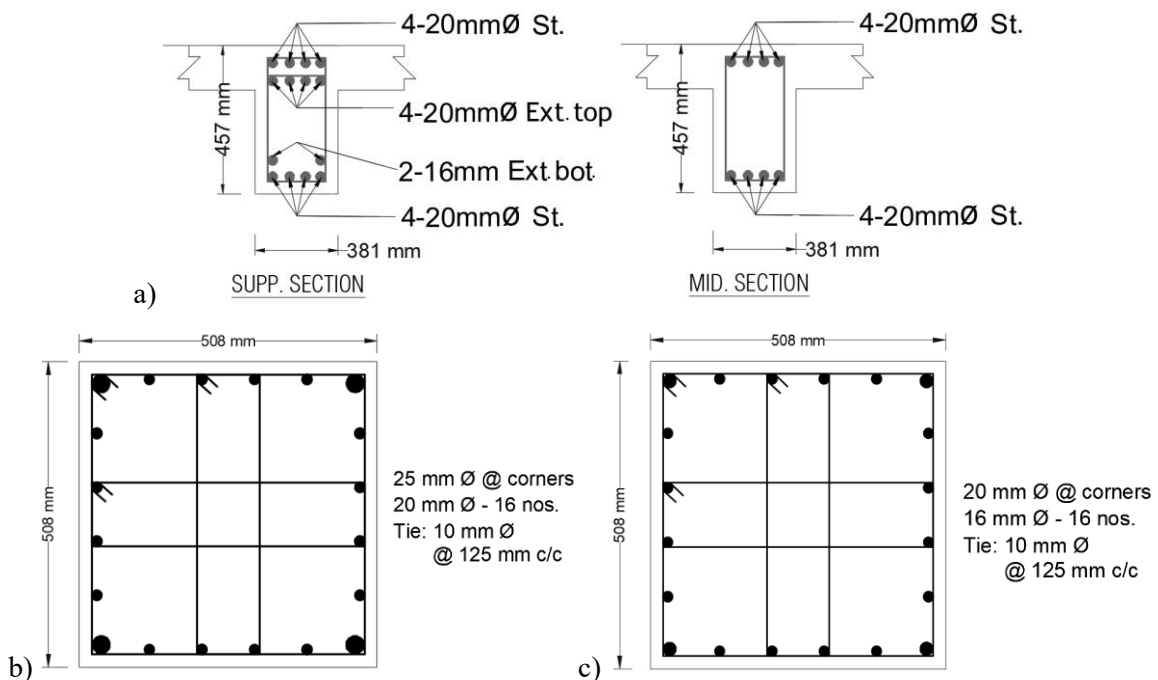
PBSD design details– a) beam, b) column up to 2nd story, c) upper story column
